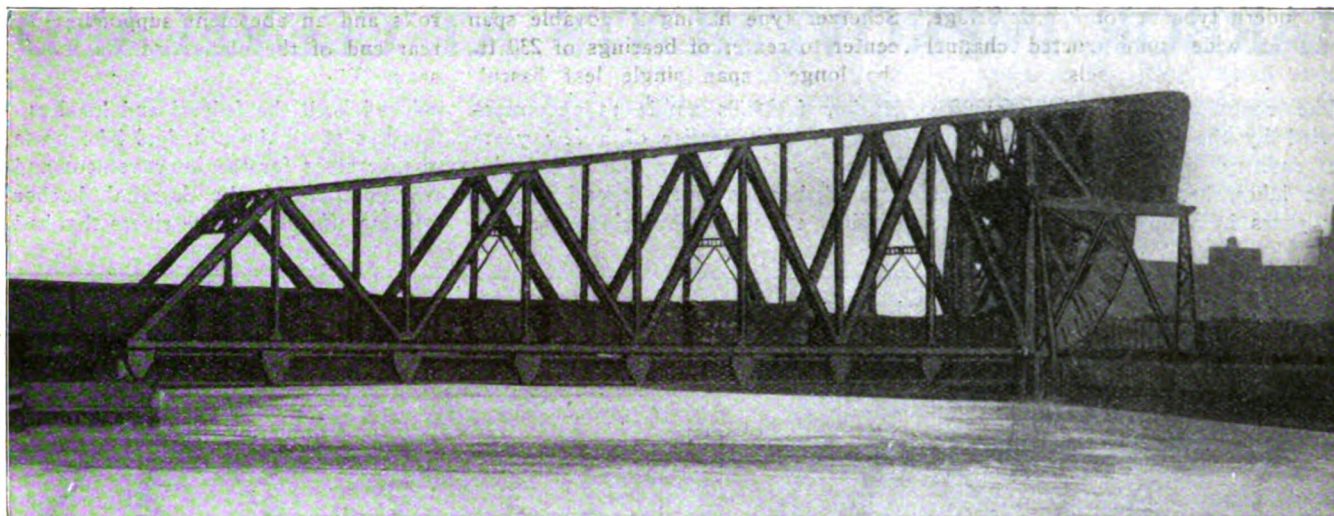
VIEW OF NEW 230-FT. SPAN SCHERZER ROLLING LIFT BRIDGE FOR B. & O. RAILROAD AT CLEVELAND IN THE CLOSED POSITION.
